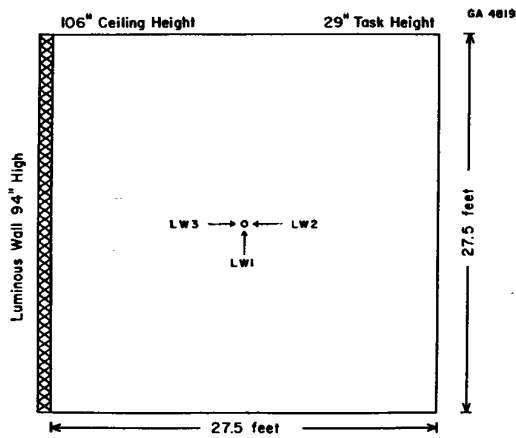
Lighting layout for luminous wall installation showing three test locations.
